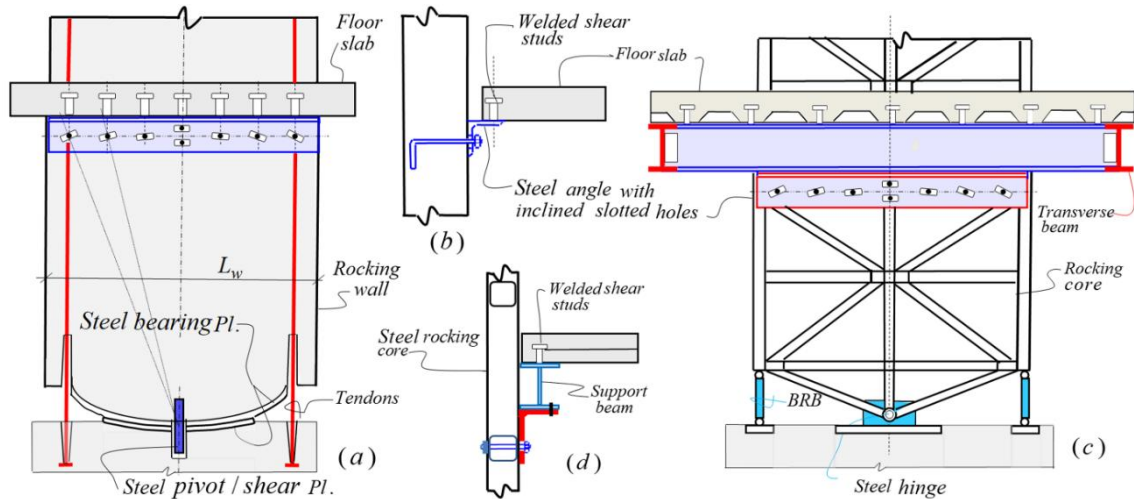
(a) Concrete RRC & diaphragm connection, (b) Side view of (a), (c) BRB enhanced Steel RRC and diaphragm connection, (d) Side view of (c)
